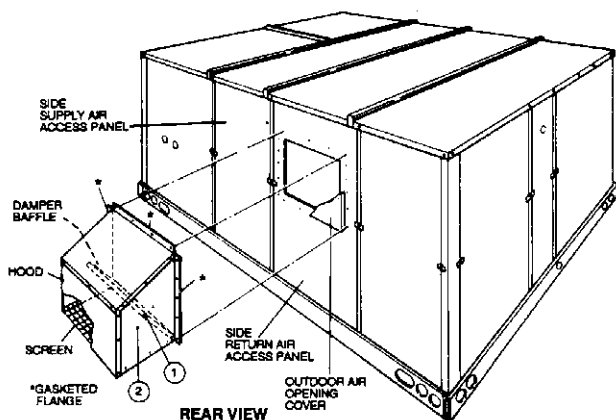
FIXED OUTDOOR AIR DAMPER
